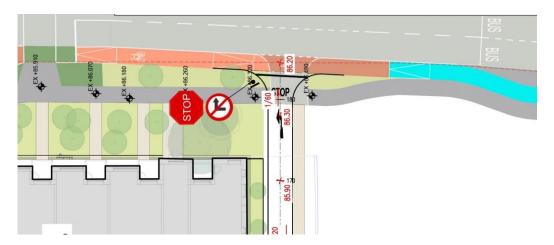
Junction 6: Site Access – Blackthorn Road (Traffic lane widths 3.0m internal and 3.25m external)
